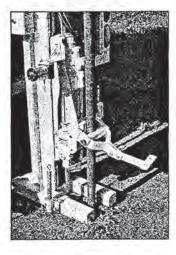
Outer casing may be retrieved with a pull cap or rod grip pull system if the probe hole is sealed with granular bentonite.
